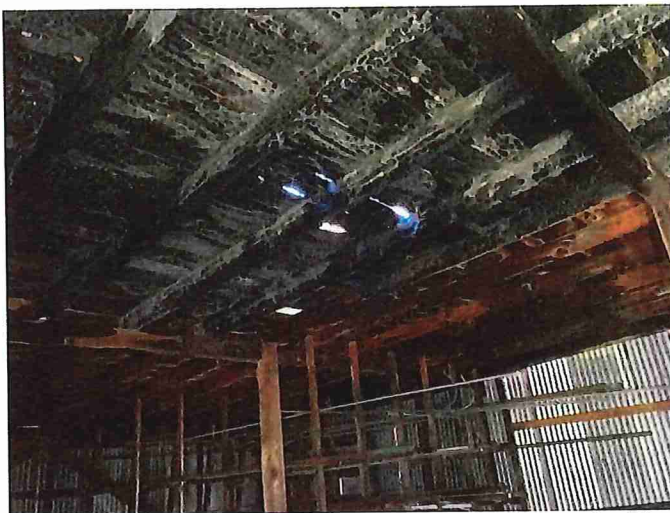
Charred wood roof framing and holes in roof at Blacksmith Shop
